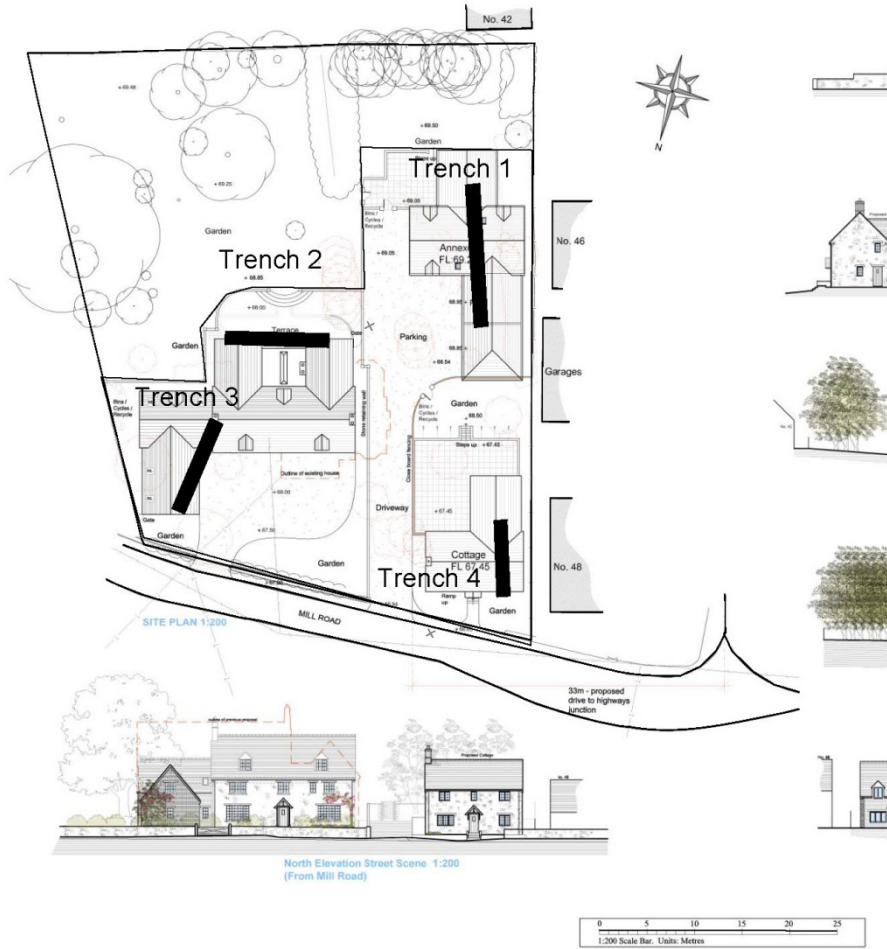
Trench location plan in relation to proposed new dwellings (plan supplied by client)
